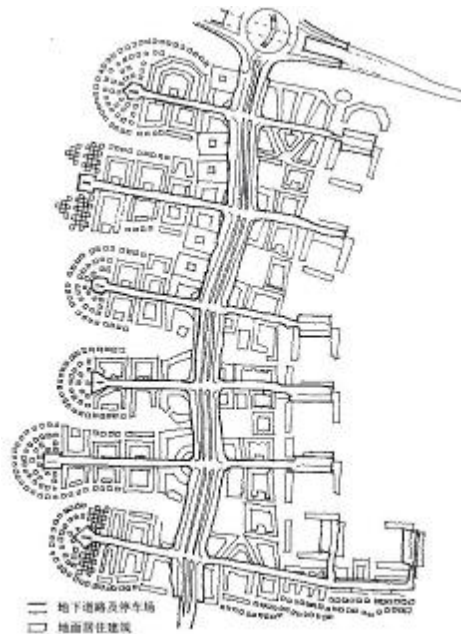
Floor plan of the underground level of Lindeborg's 'Double-Deck Town'
